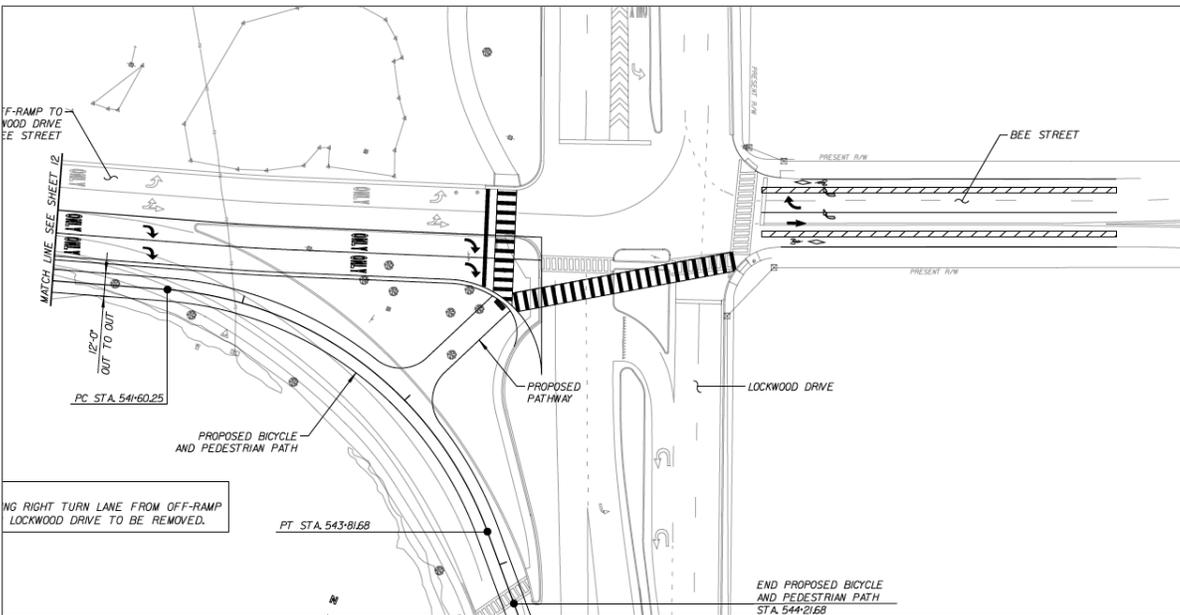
Ashley River Crossing landing area improvements at intersection of Bee and Lockwood.
